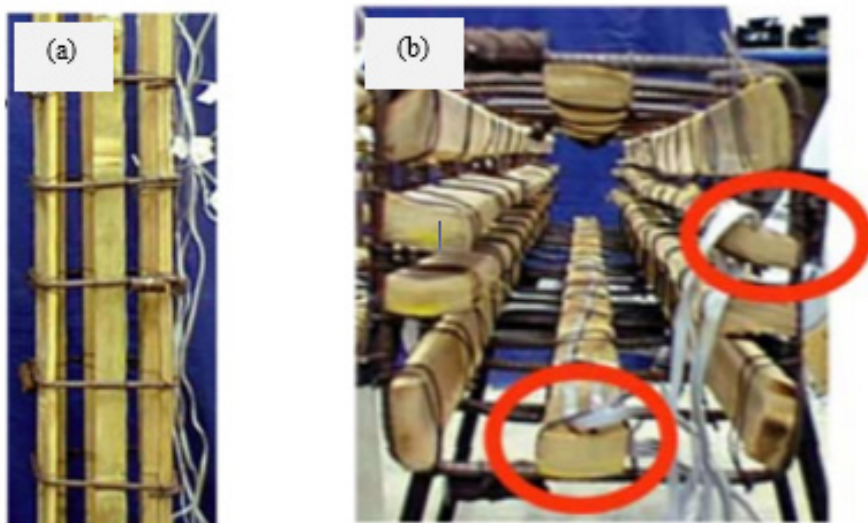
Bamboo column reinforcement (a) front view (b) top view
